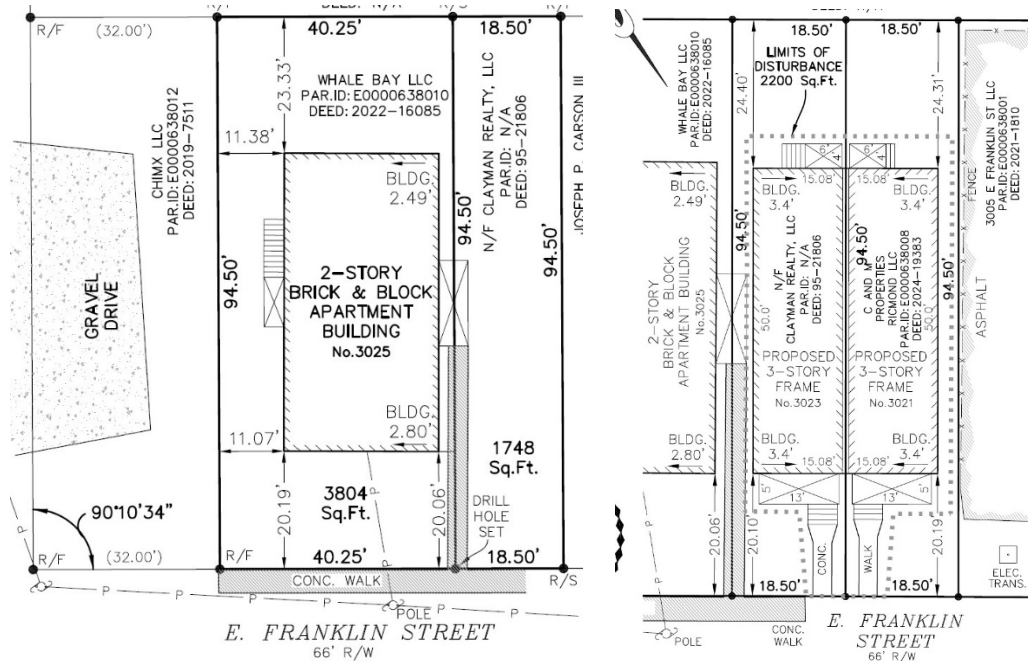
Division of lot (left) and Site plan of proposed dwellings including 3021 E Franklin St. (right)
